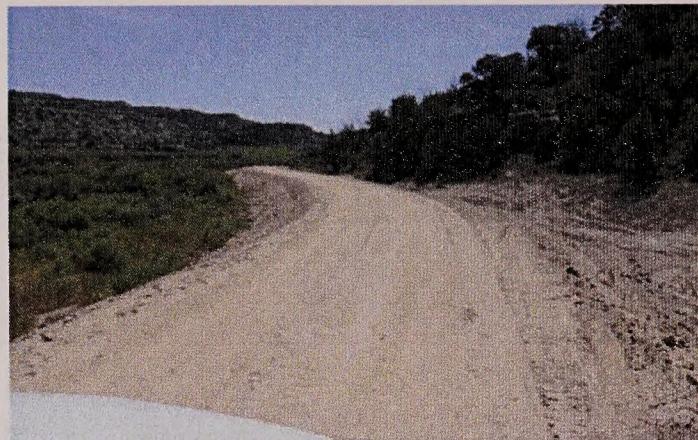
New Bradley Road Complete with Culverts and Sediment Retention Ponds
